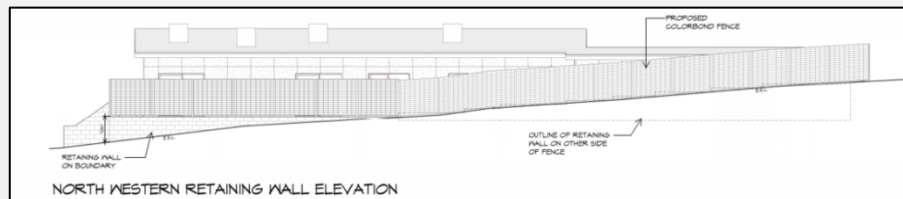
Northwestern elevation facing the adjoining property at 19 Brigalow Street, Legana
